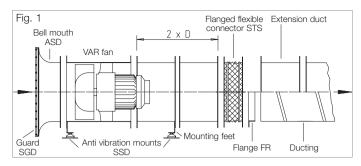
shows an in-line duct installation. VAR fans can be mounted direct in the ceiling above the void. The casing is designed for straight in-line installation using the flanged ends (to DIN 24155 Pt. 3).
